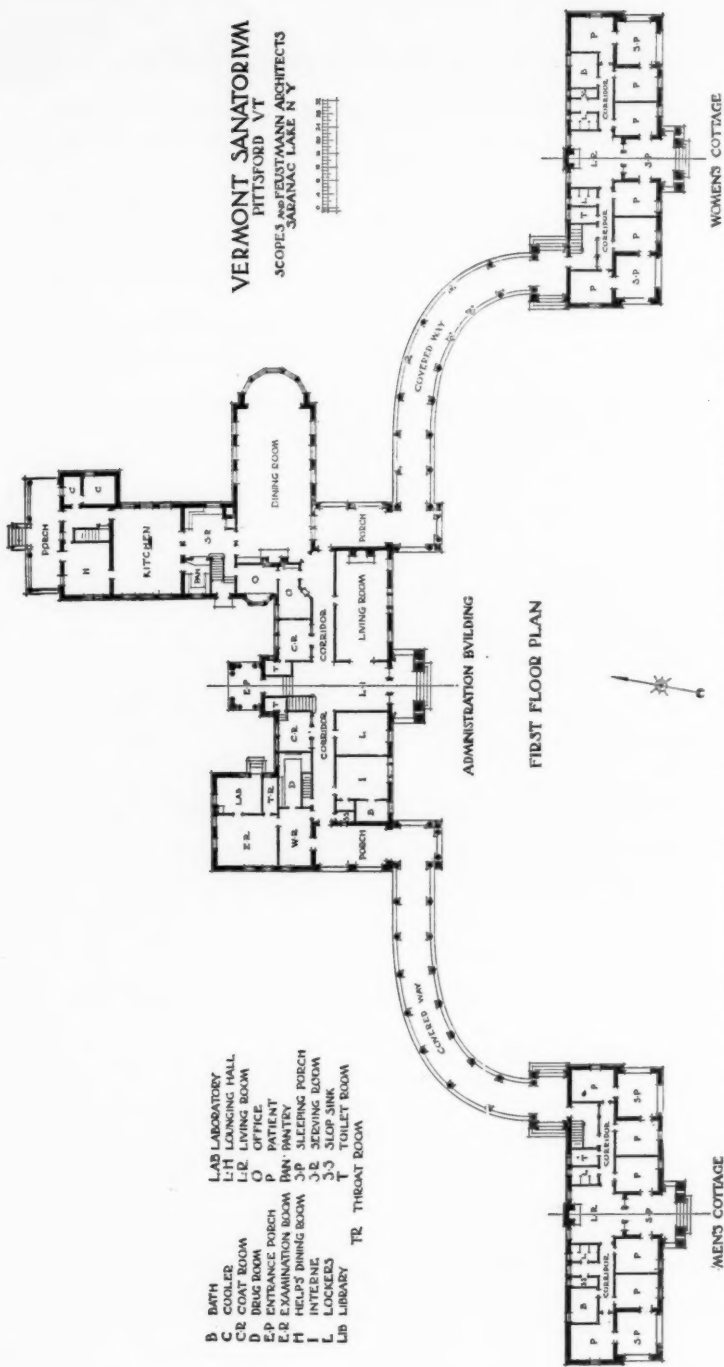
GROUND-FLOOR (FIRST-FLOOR IN U.S.A.) PLAN OF VERMONT SANATORIUM
